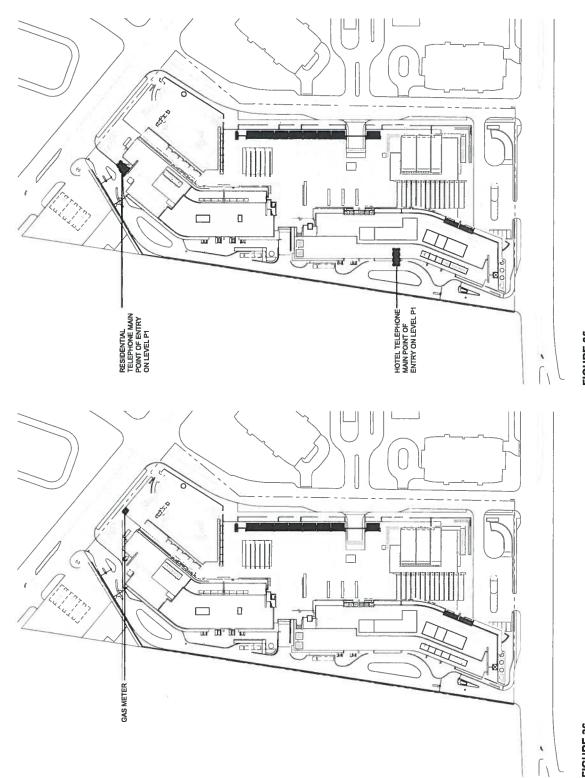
TELEPHONE PLAN ONE BEVERLY HILLS
